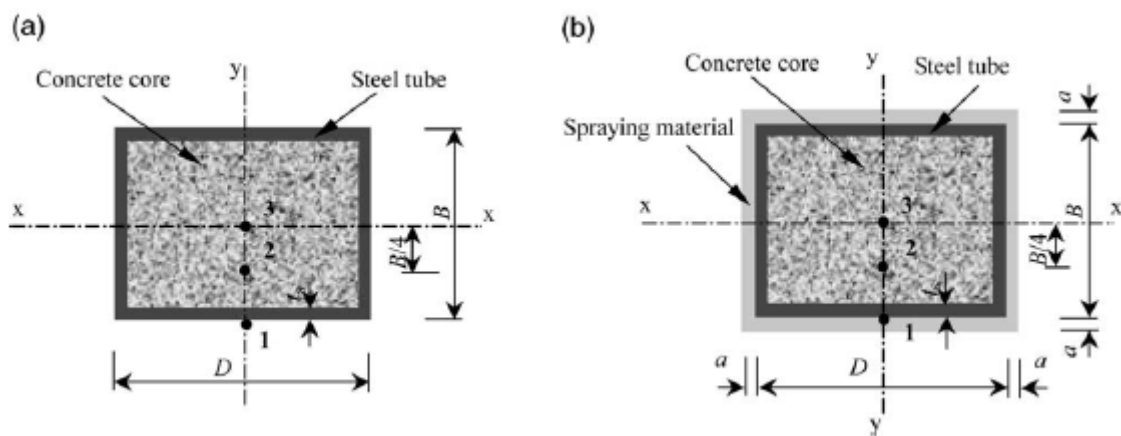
10 - Typical cross-section of the specimens, (a) without fire protection; (b) with fire protection (Han et al., 2003).
